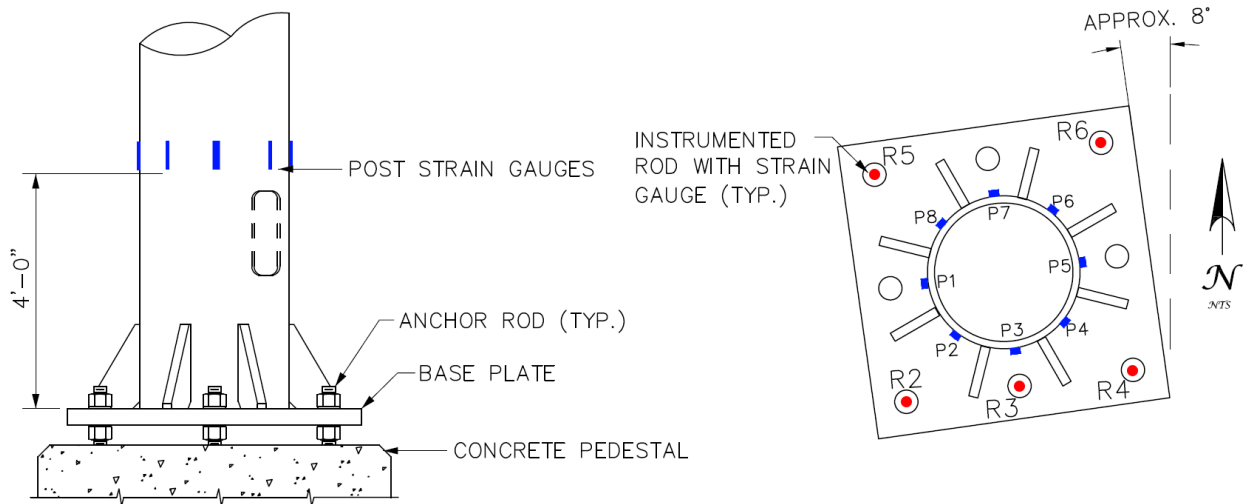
Lower post instrumentation elevation view (left) and post base instrumentation plan view (right)
